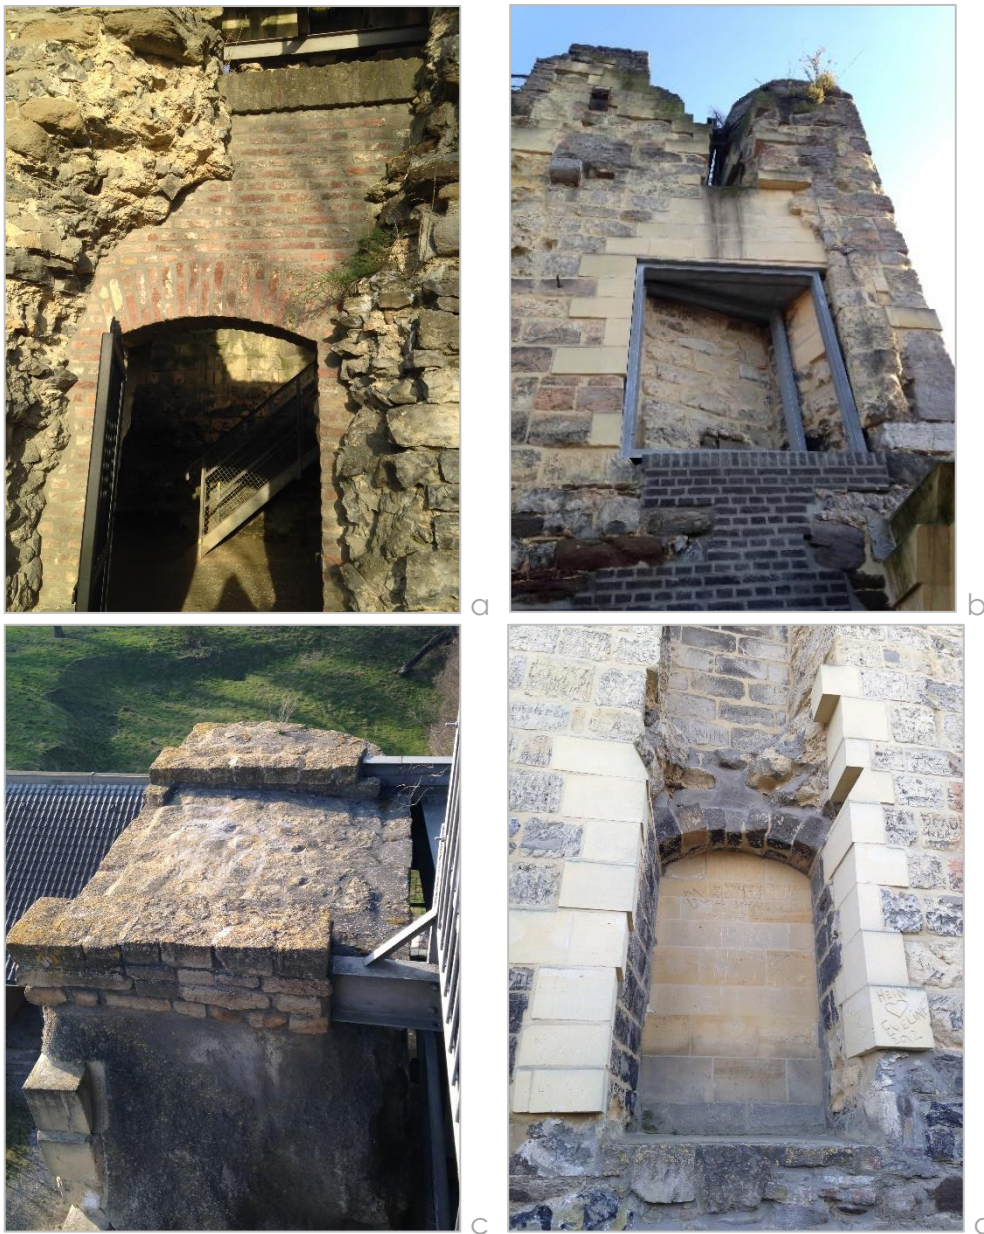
Examples of materials to be replaced: a) brickwork entrance; b) steel frame, regular masonry and limestone wall; c) concrete topping and masonry with embedded steel; d) limestone fillings for former doors and window openings. Photographs by author.
